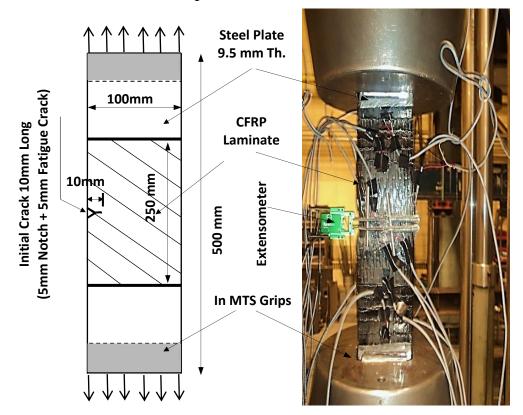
Test setup in MTS 1000 and the specimen's geometry
